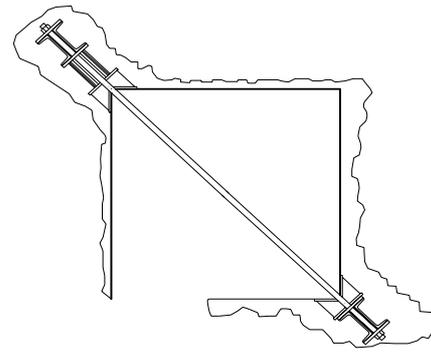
Diagonal compression test layout (panel dimensions 1200 x 1200mm)
